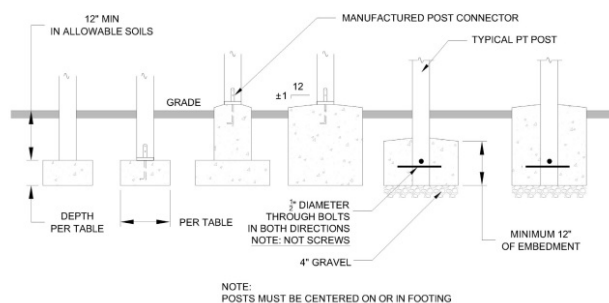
DECK POSTS TO DECK FOOTING CONNECTION
